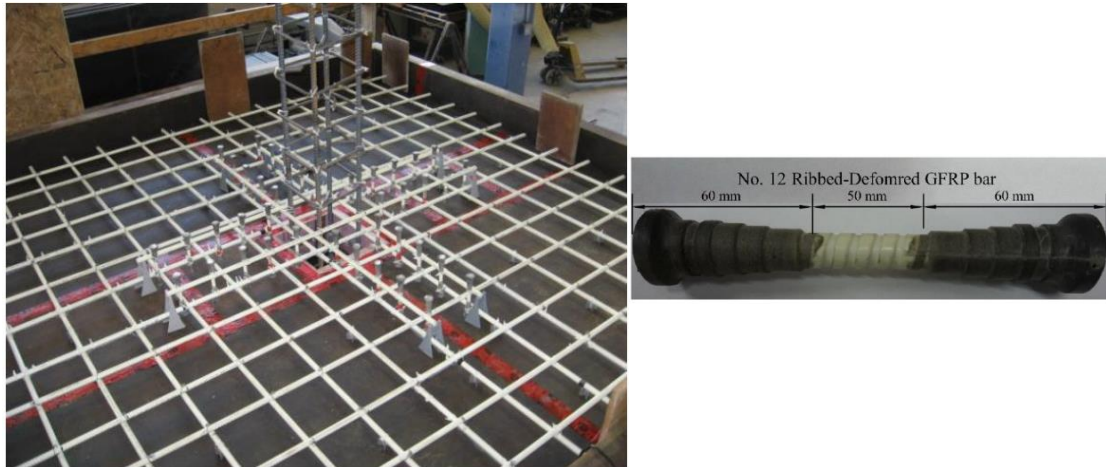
Photo for the reinforcement configurations for the specimen.
